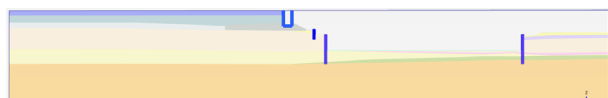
Longitudinal section A-A crossing the dam, the canal bridge and the excavation. Structural elements are blended out.
